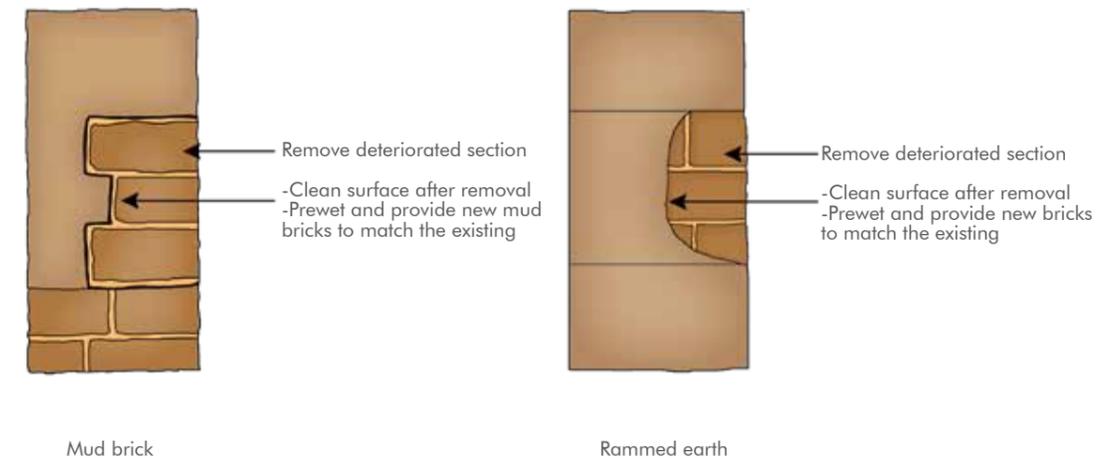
Detail of filling larger voids for mud brick and rammed earth constructions
